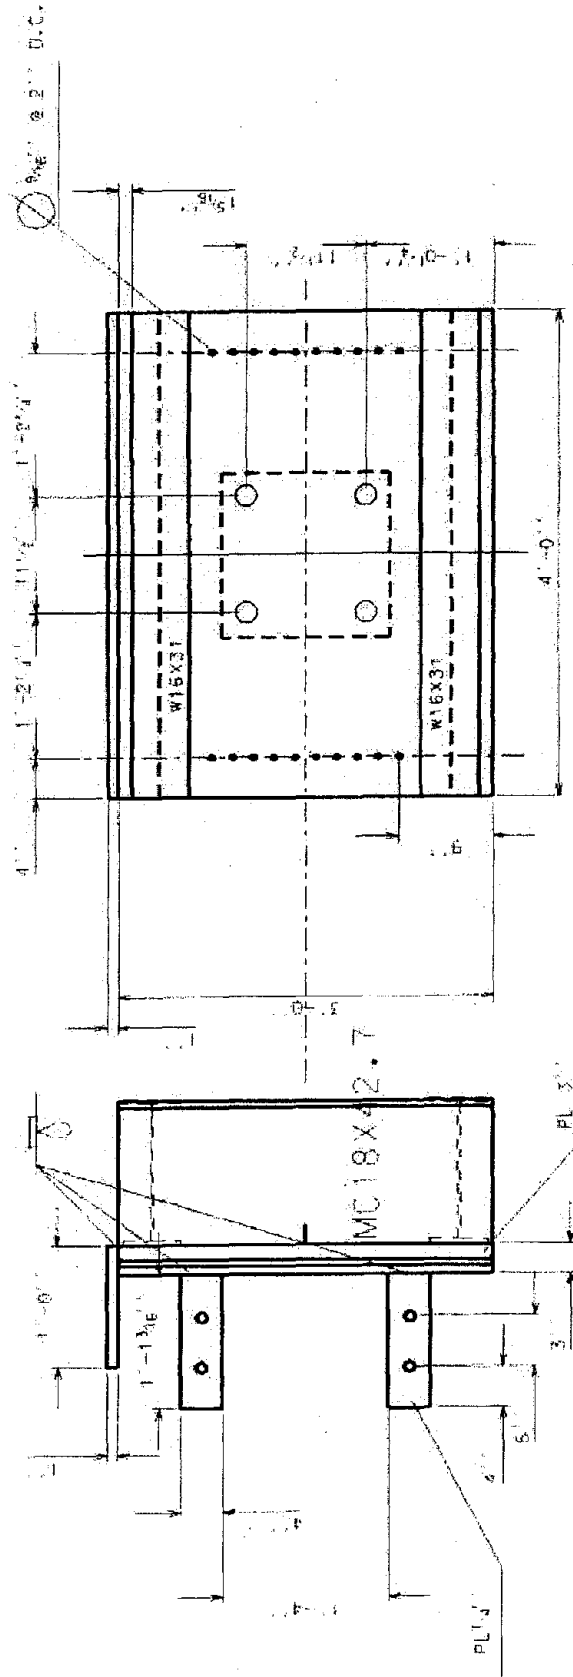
Construction drawing of beam cap mounting bracket (1' = 305 mm, 1" = 25.4 mm)
